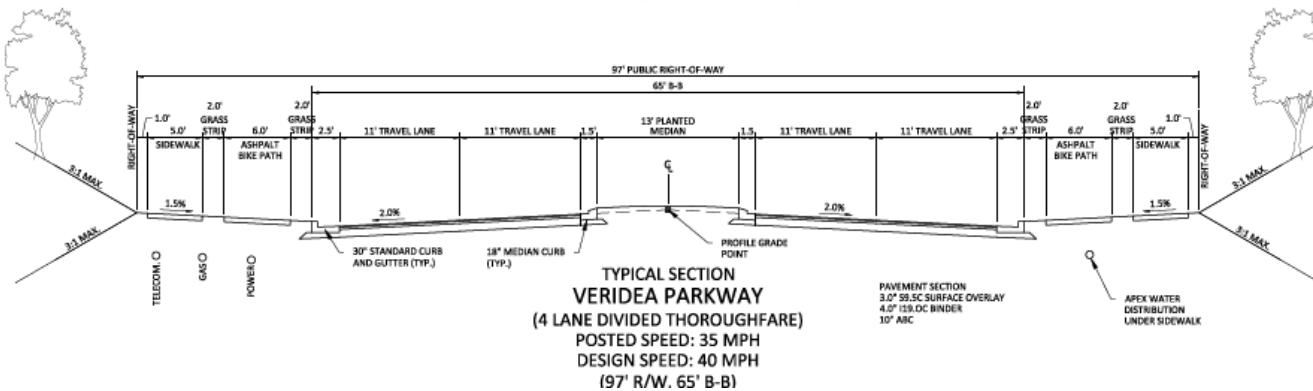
Typical Section for Veridea Parkway (4-lane) showing separated bicycle lane and sidewalk
